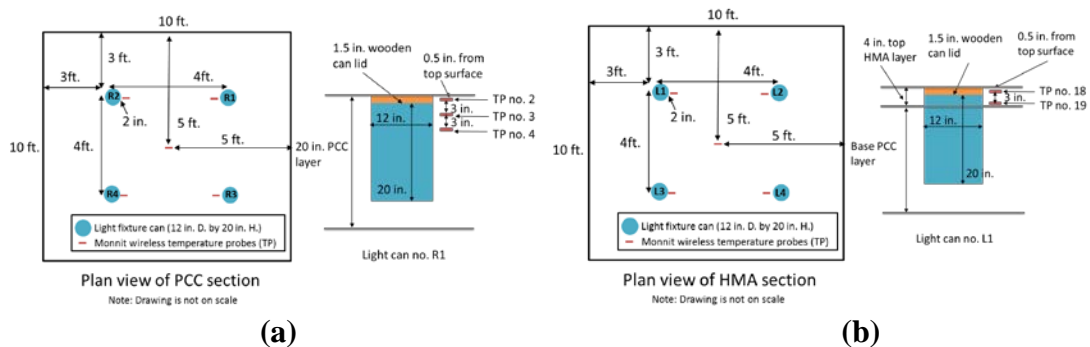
Layout plan of wireless sensors and LED light cans in the TAMU test site for (a) PCC slab, (b) HMA slab.
